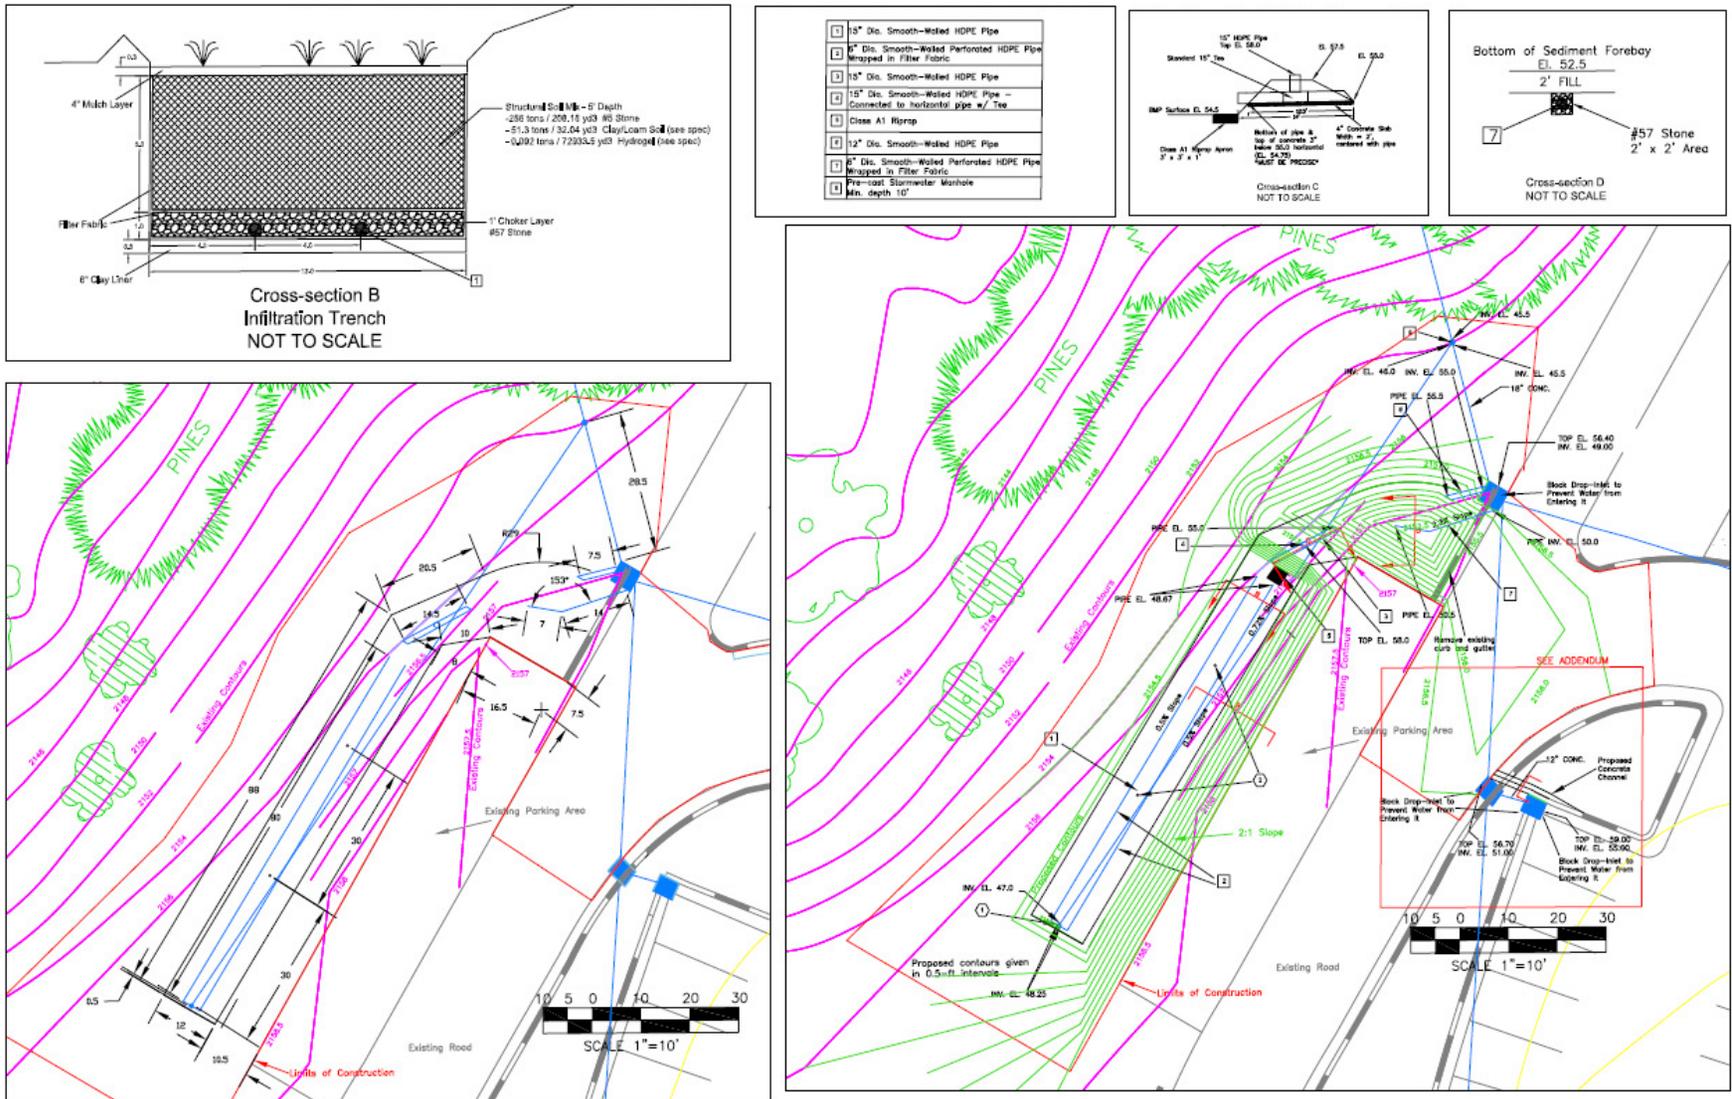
Construction drawings for structural soil infiltration trench. Drawings not to scale.
